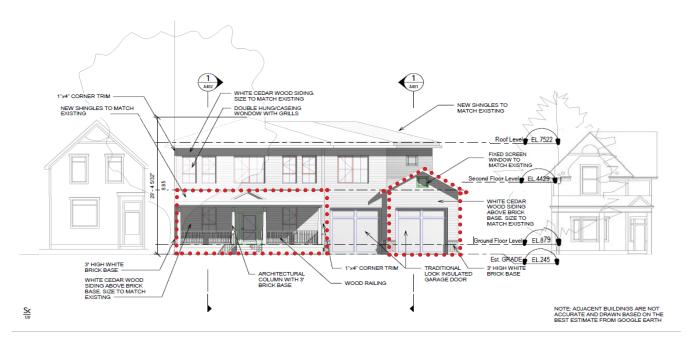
Front/South Elevation. Red dotted lines indicate existing outline of original house and garage to be incorporated into proposed addition/renovation. Drawing by Third Layer Architects, 2021.
